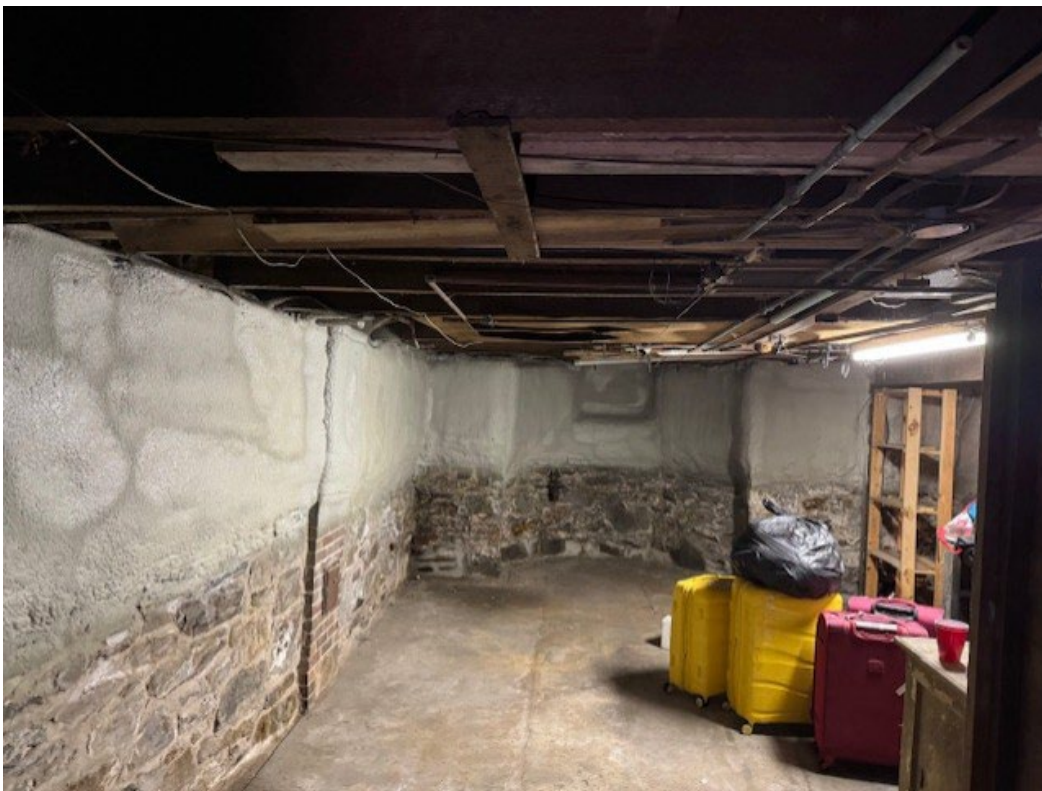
Photograph of the basement of subject property showing foundation and framing (Provided by applicant).
